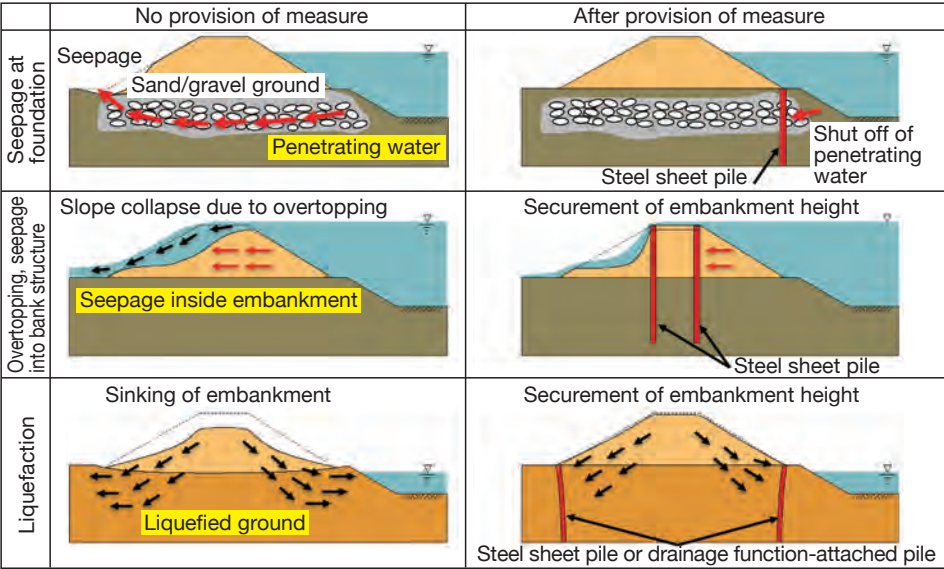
Examples of Embankment Reinforcement Using Steel Sheet Piles
